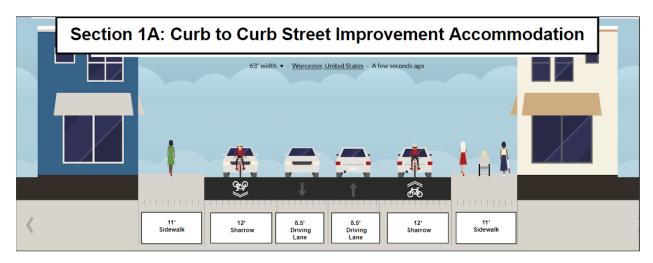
Curb to Curb Street Improvement Accommodation, Section 1A
